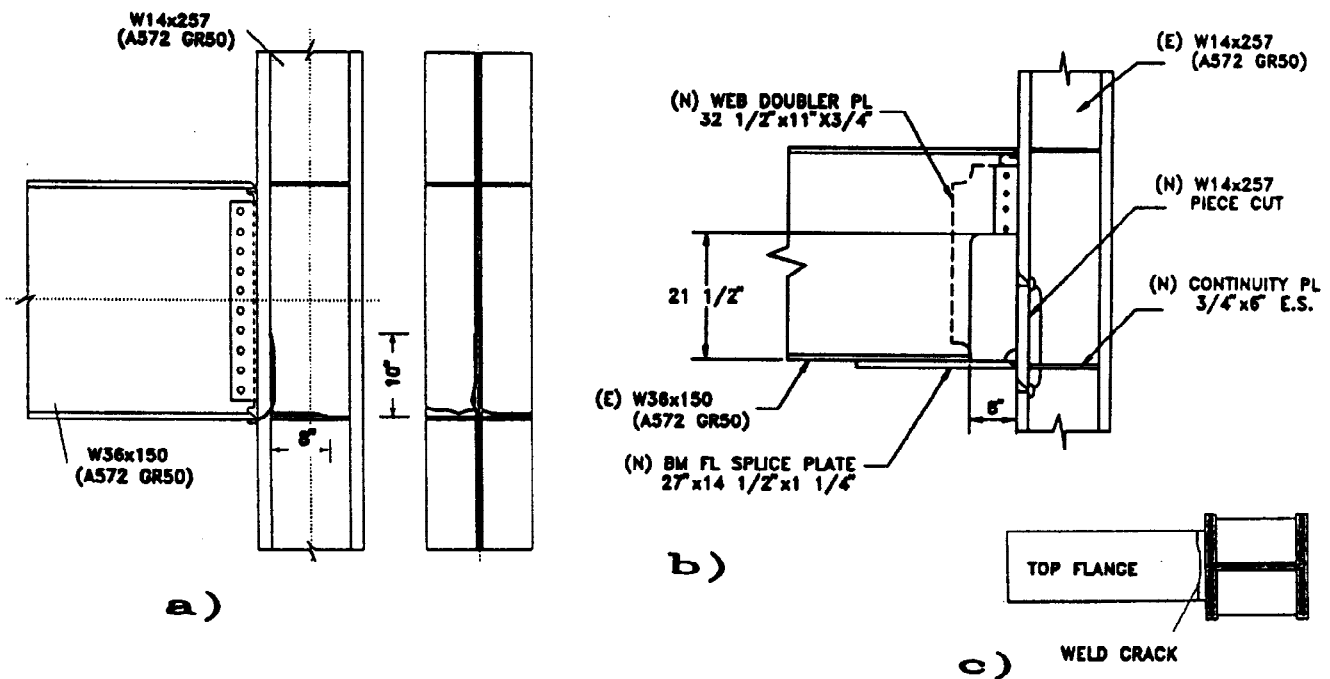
Specimen 1 -- Damage, repair, and damage of repaired connection
